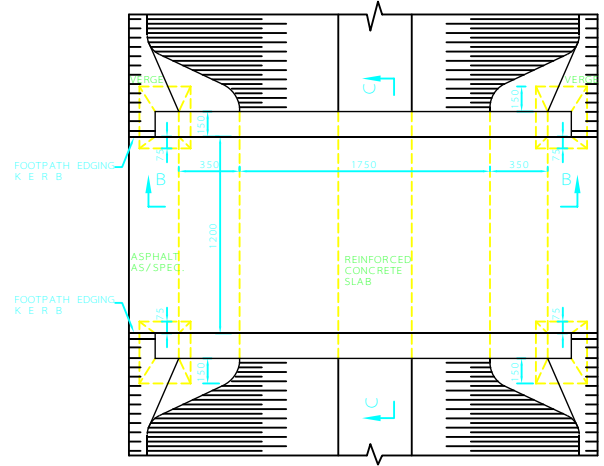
No. CROSSING SLAB 75mm. THK.
